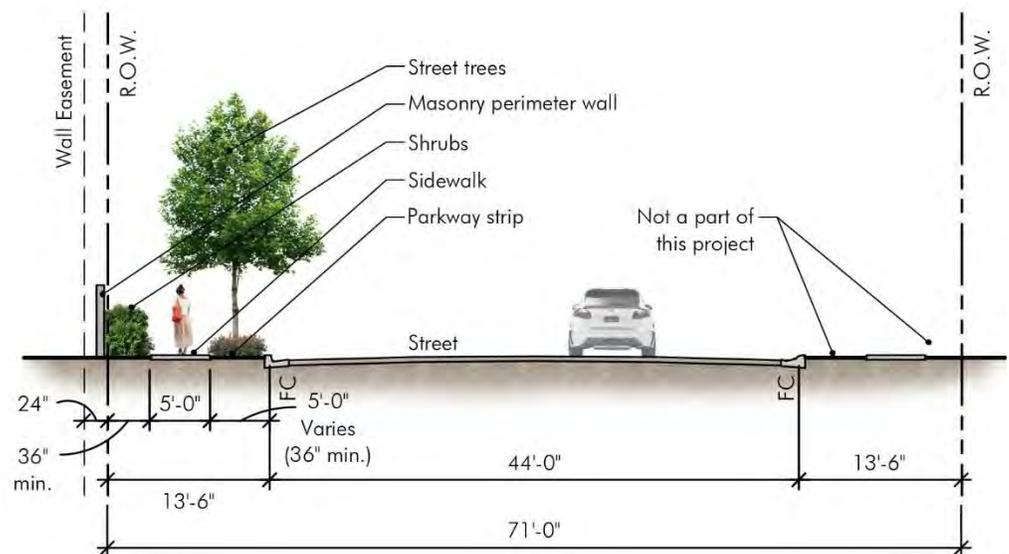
South Stockton Street – South of Street D (looking north)
